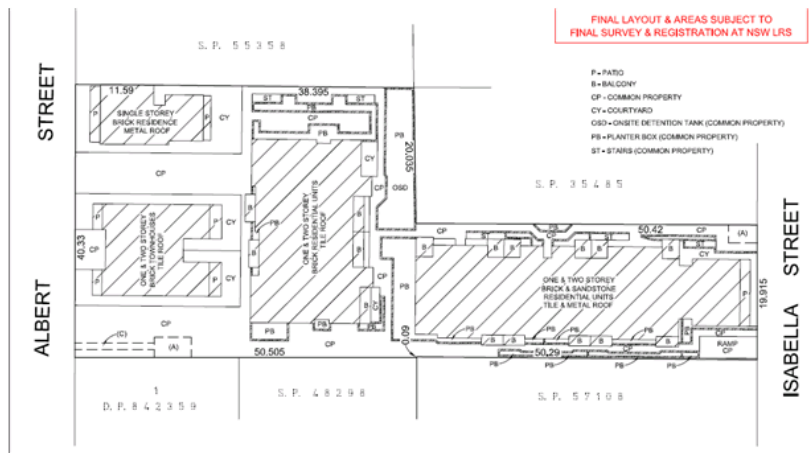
Location plan for plan of Strata Subdivision (extracted from submitted plans).
